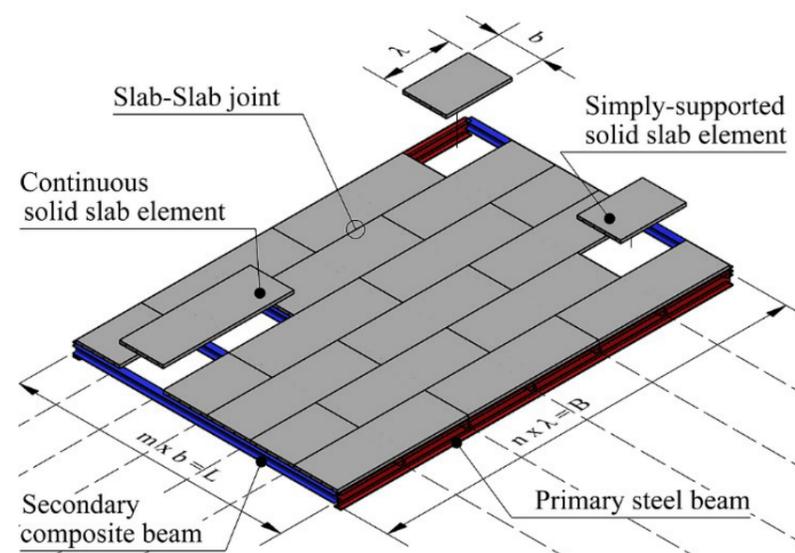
Prototype 3 — Block typology: demountable floor – steel-concrete
